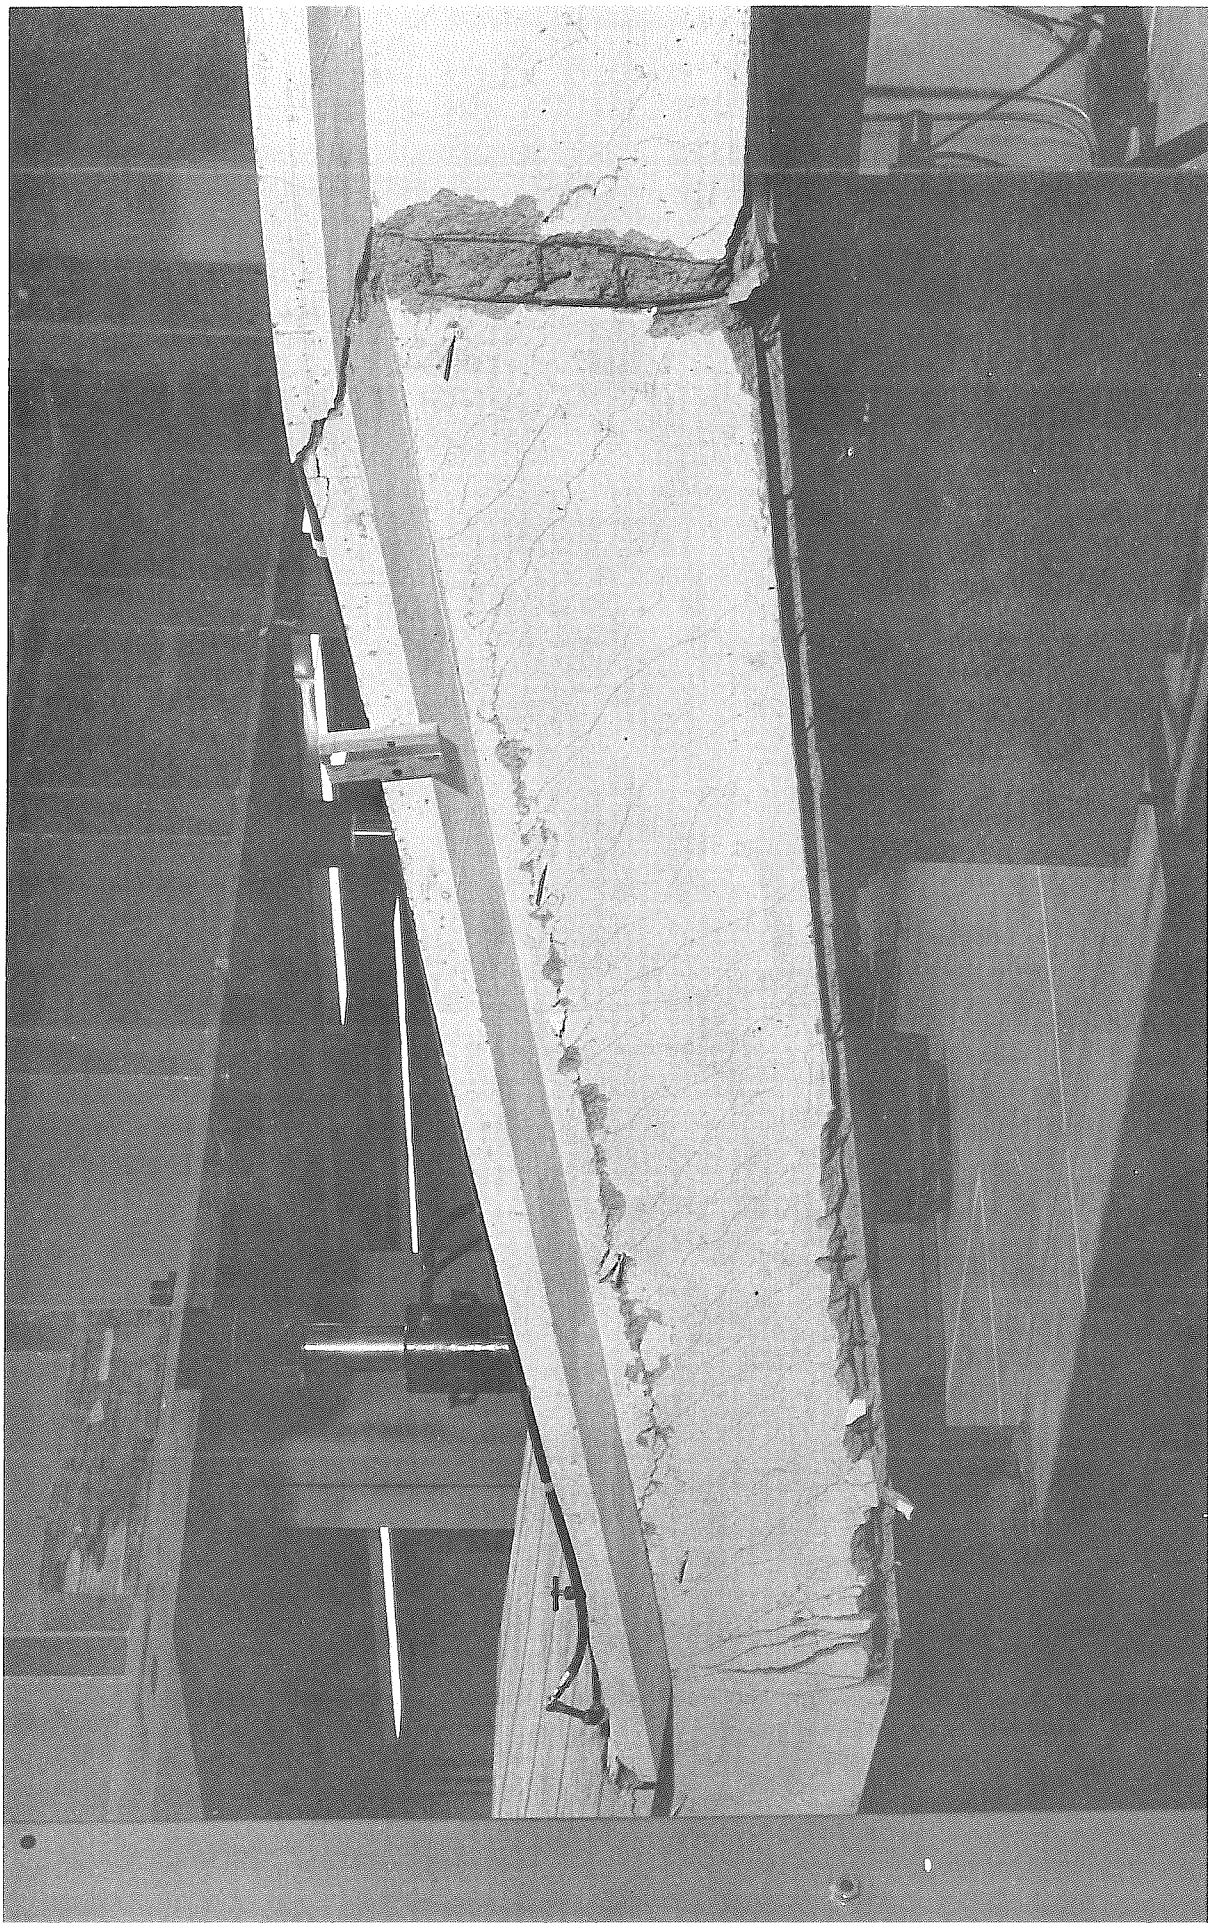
FINAL DEFLECTED SHAPE AND CRACK PATTERN FOR GIRDER 1
